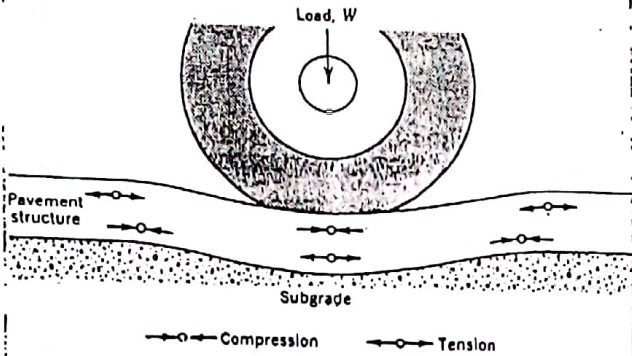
Pavement deflection results in tensile and compressive stresses in pavement structure. (Courtesy The Asphalt Institute.)
